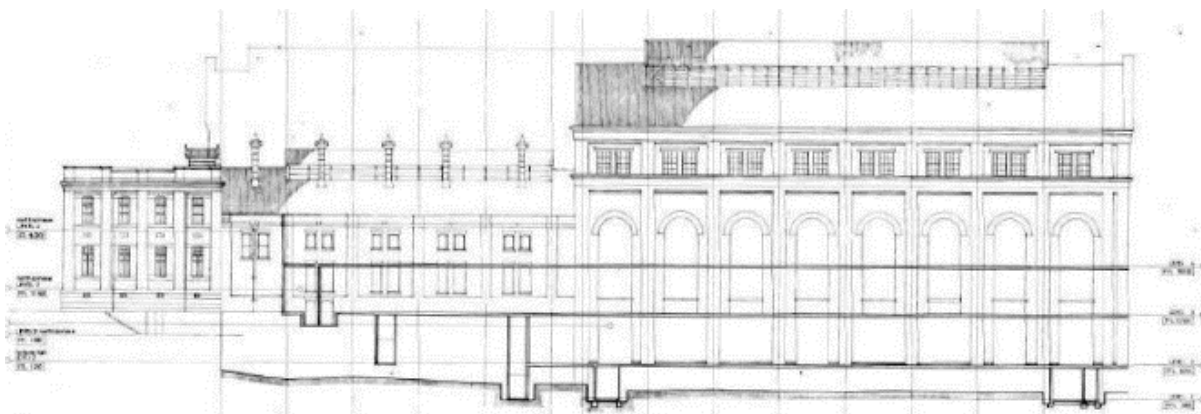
1984 MAAS Construction plan. Section 14 faces west and pictures the North Annexe, Engine Hall and Turbine Hall (left to right). The basement of the Turbine Hall is 3.2m deep. (Source: AMBS 2018)
